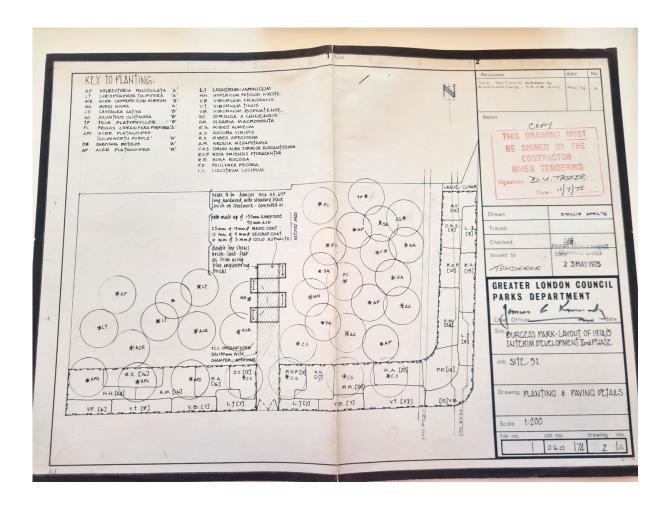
Clearance and Site Layout Plan for site at St George's Way, Burgess Park, Site 51, 1974. LMA Site 51 – Clearance and Layout. Ref: GLC/RA/D2G/07/026.
